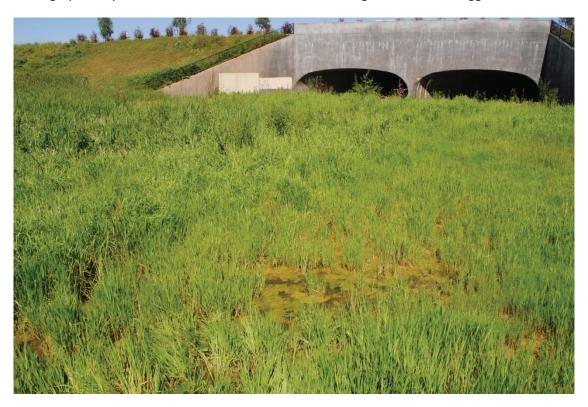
Wetland Area at Clinton Keith Road/Leon Road Intersection in April 2010 – Facing east looking at Briggs Road
